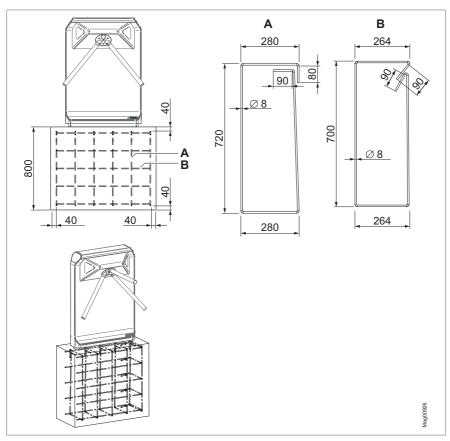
Reinforcement plan FMTP-MS (dimensions in mm)
